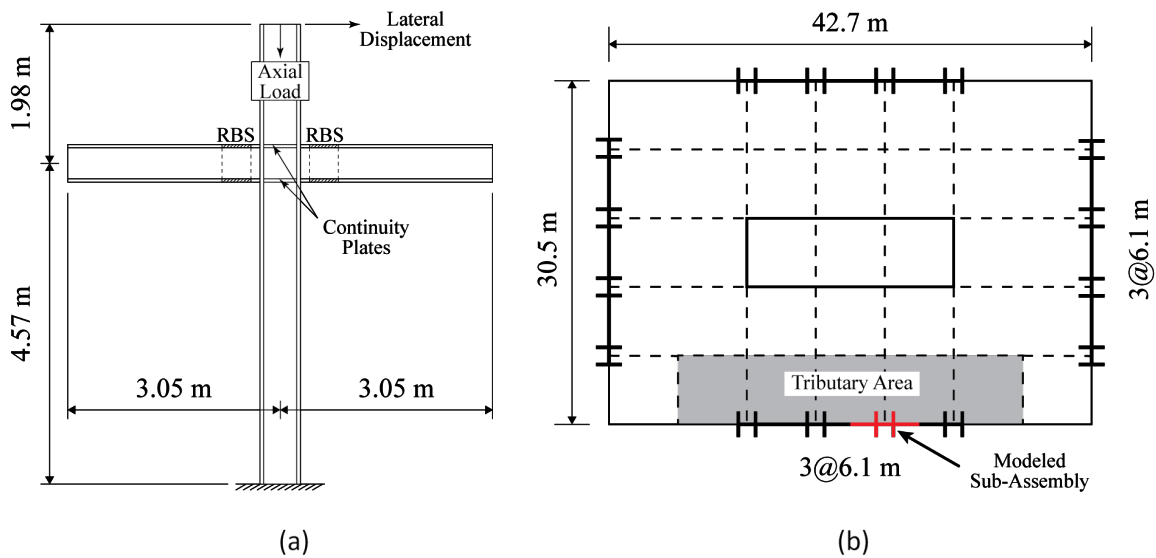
(a) Schematic of the wide flange column subassembly and (b) typical building plan of the steel moment resisting frames.
